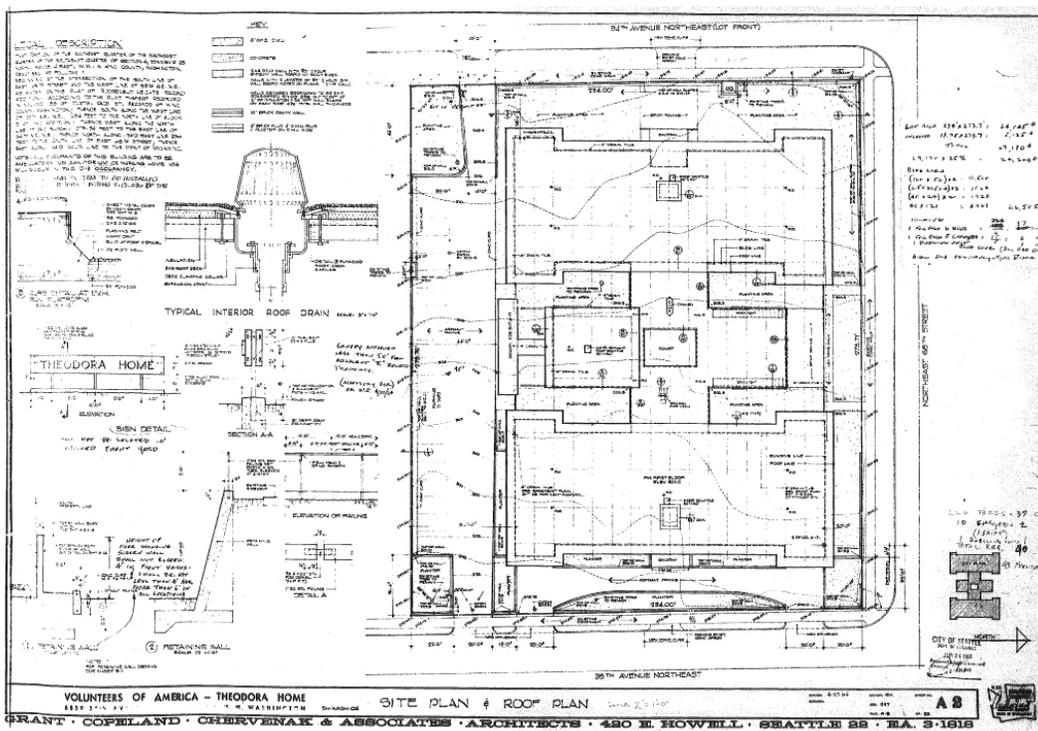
Original Building Site Plan (Seattle Department of Planning and Development archives)
